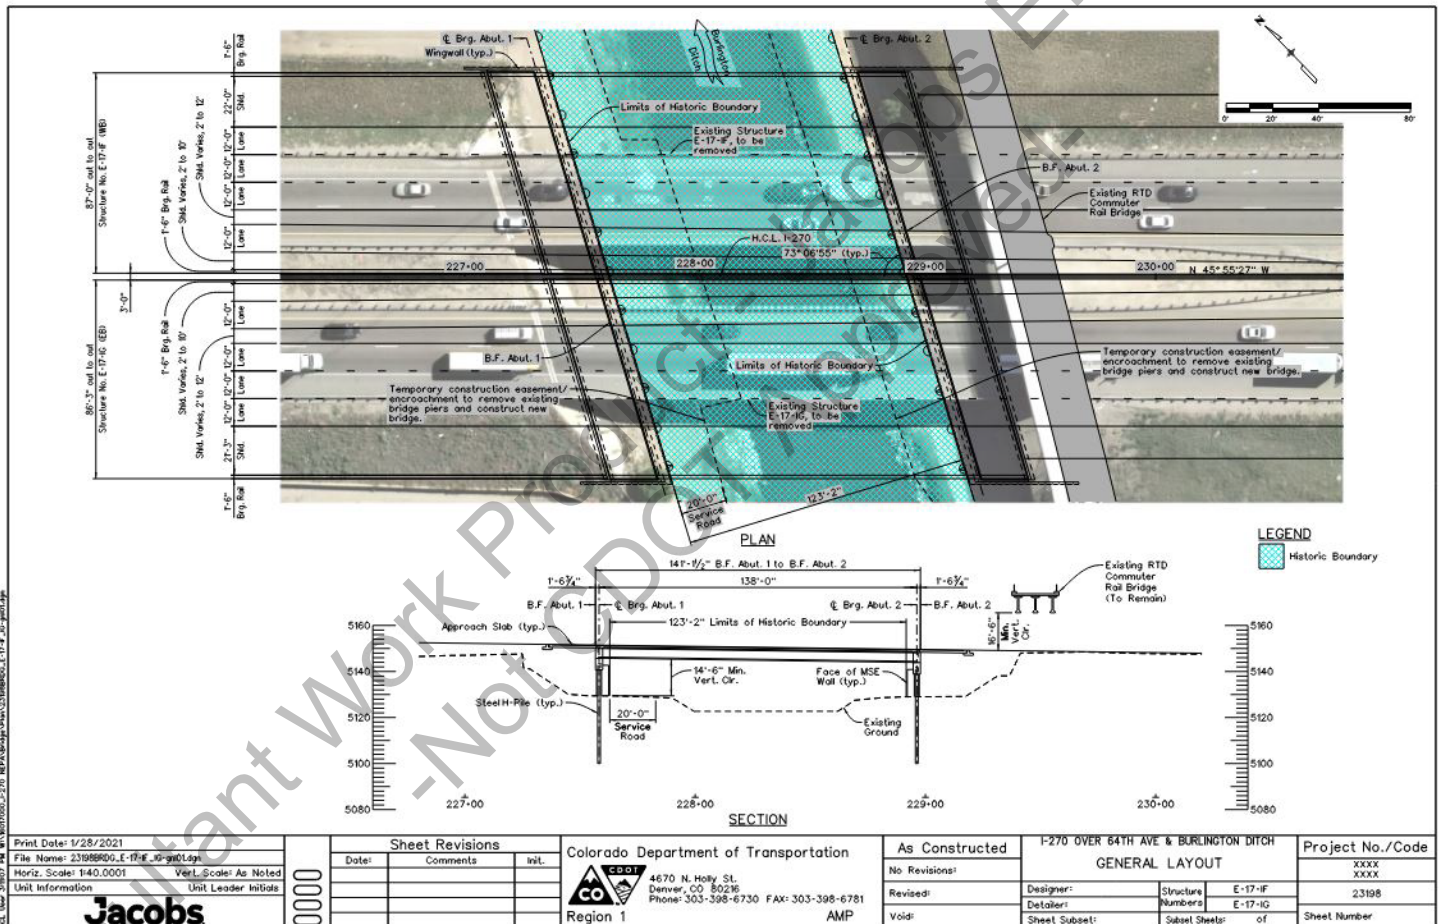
The plan view and cross section for the proposed improvements indicate the limits of the historic boundary of the Burlington Ditch (in blue) and the replacement bridges that would span the historic boundary, with piers placed outside of the historic boundary. The temporary easements are also depicted on this diagram.
